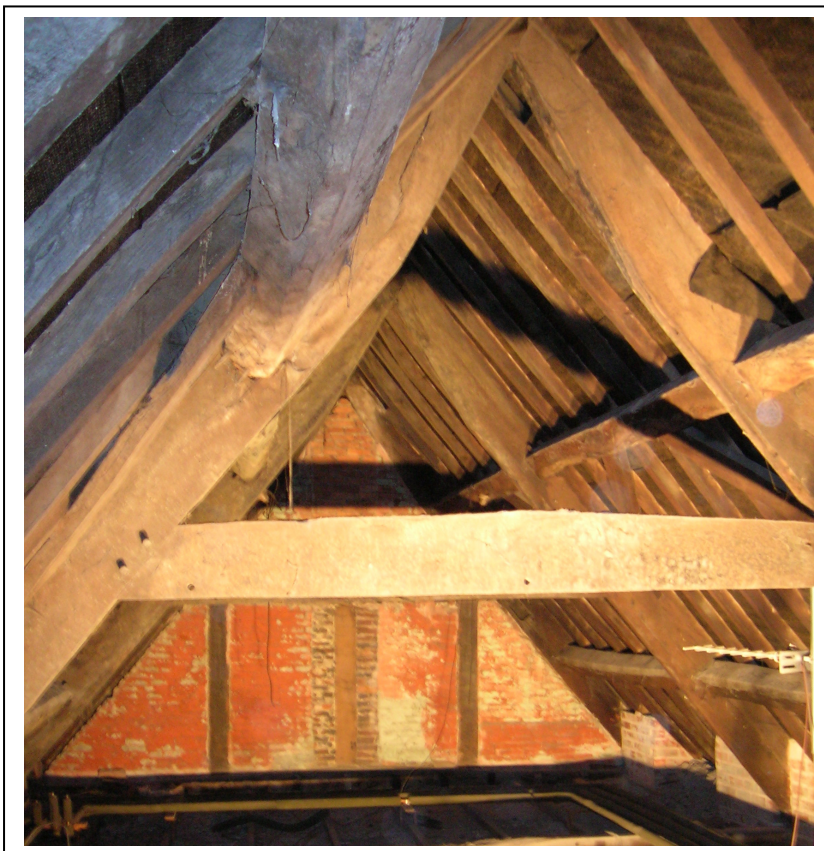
(top): View of trusses A (to right) and B (to left) of the Gatehouse proper
